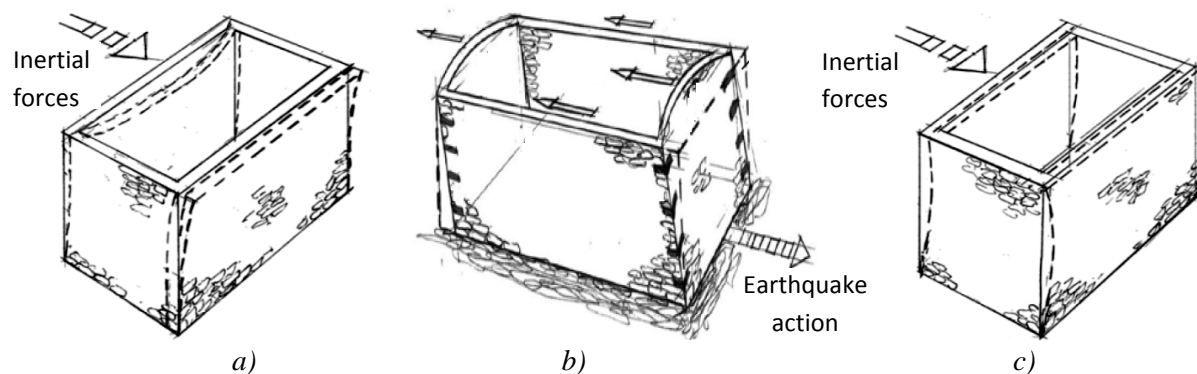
Structure behavior according to floor diaphragm: a) poor connection of walls with slab (cantilever condition), b) good connection flexible slab, c) rigid floor diaphragm [BB 11]
